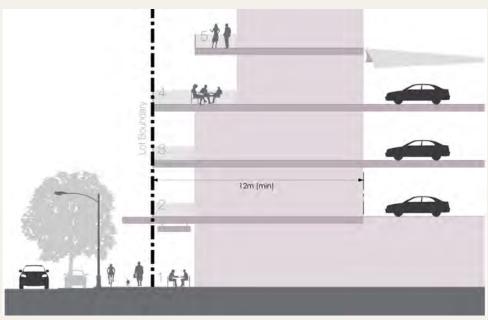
MIXED USE R-AC0 AND RESIDENTIAL 2 R-AC0 PARKING - ABOVE GROUND CAR PARKS SLEEVED BEHIND UPPER FLOOR BUILT FORM AND SHADED
